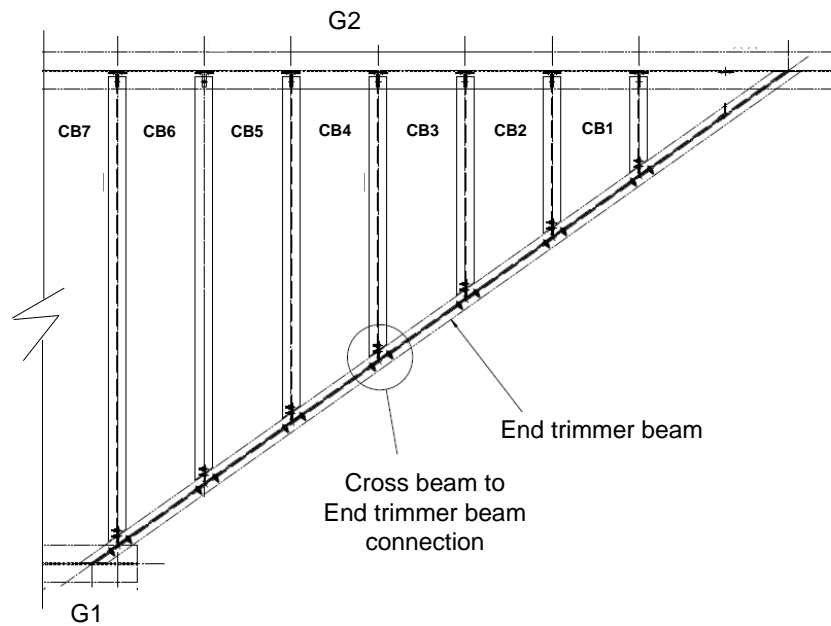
Schematic of right side of the bridge showing the cross beams to End trimmer beam connections (WSR).
